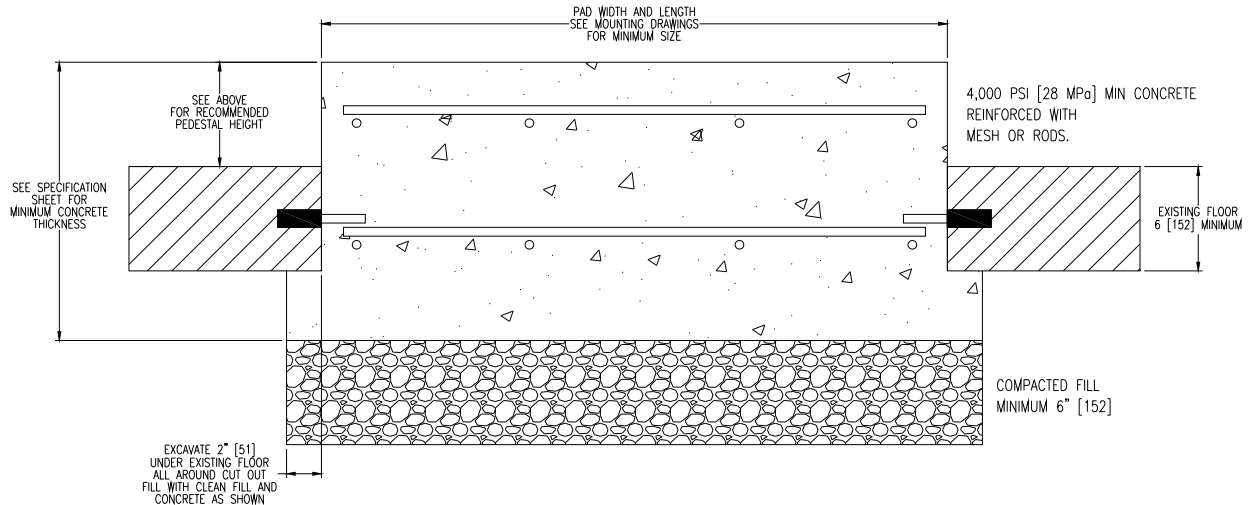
New Raised Concrete Pedestal Tied to Existing Floor
